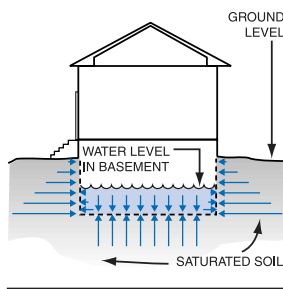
A house with a wet floodproofed walkout-on-grade basement.
